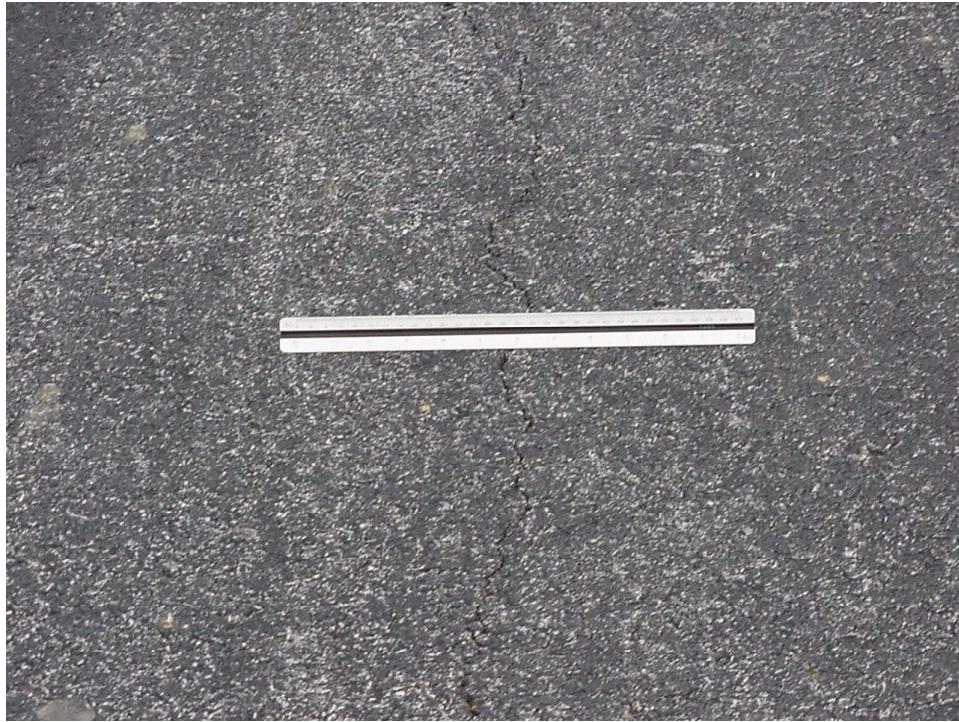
Perimeter Taxiway, Feature T6B, low-severity longitudinal crack
